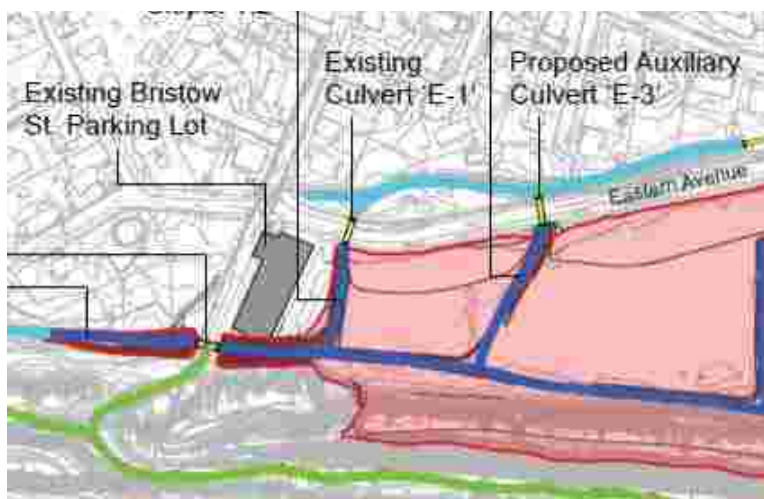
Location of Proposed Auxiliary Culvert "E-3"
